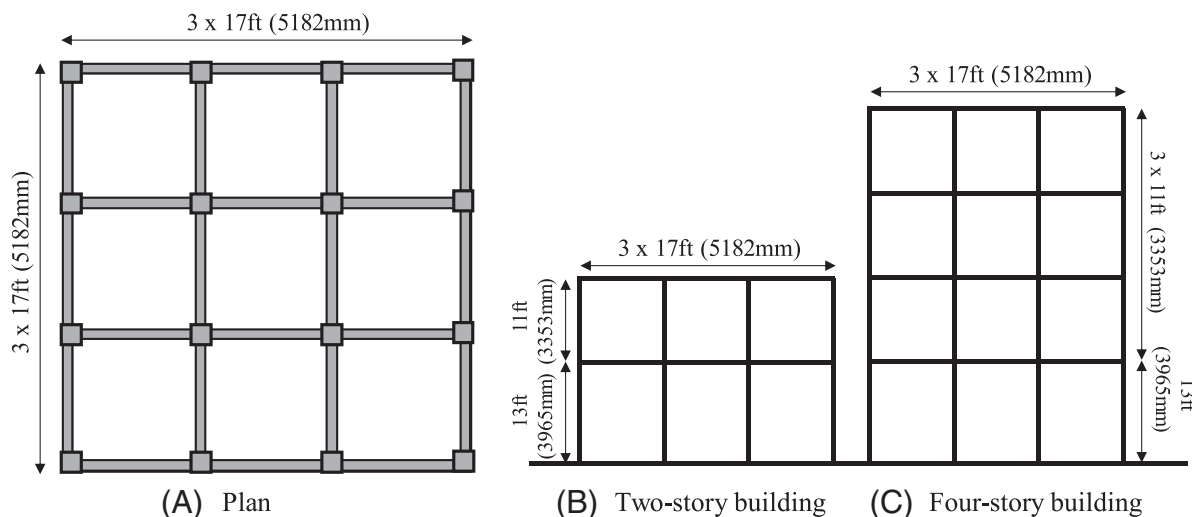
Case-study buildings. (A) Plan, (B) two-story building and (C) four-story building
